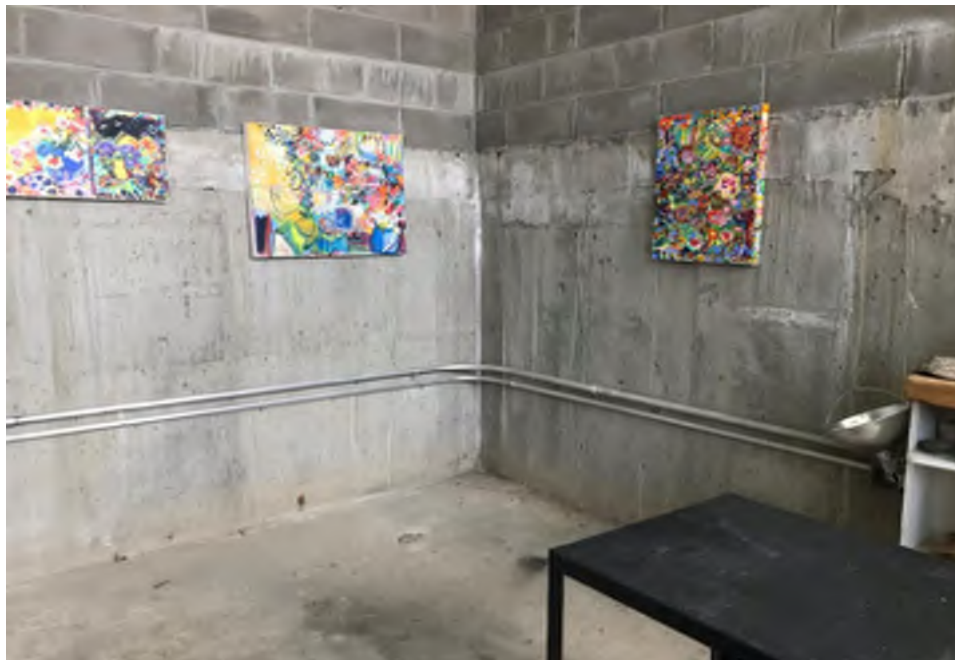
Subgrade parking garage foundation wall (beneath the first floor), facing northwest. 30 March 2021.
